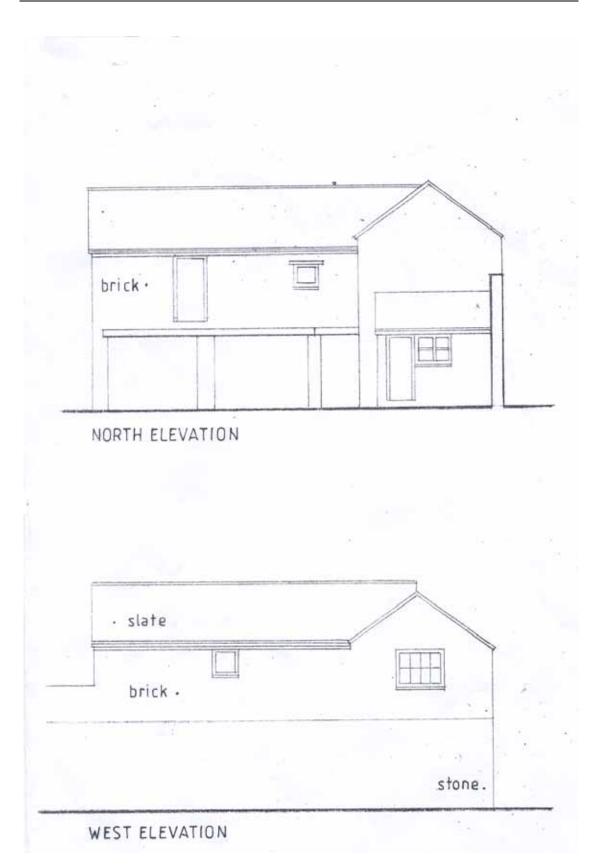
Northern and Western Elevations. (Not to Scale, Drawing Supplied by Client)
